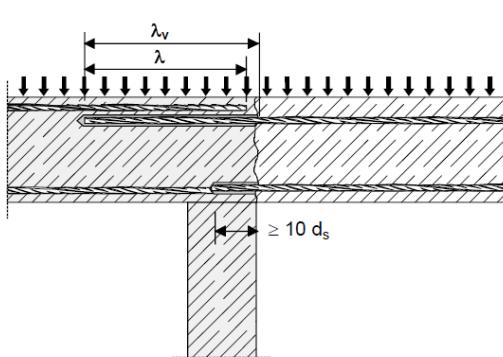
Overlap joint for rebar connections of slabs and beams
